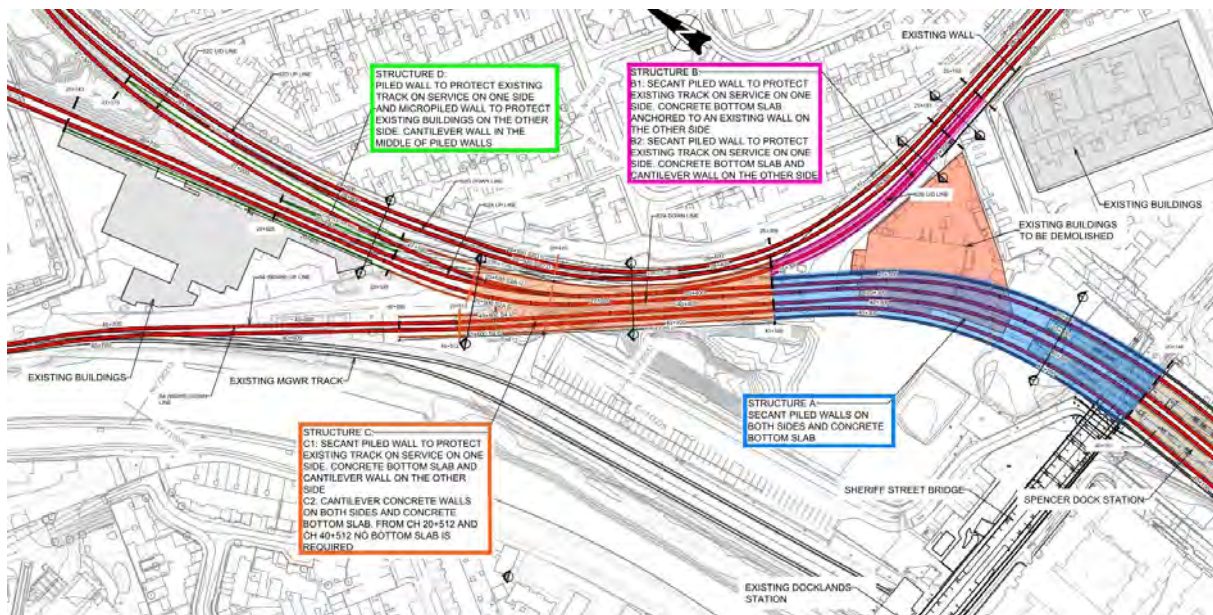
Extents of retaining walls and protection slab in Spencer Dock area
